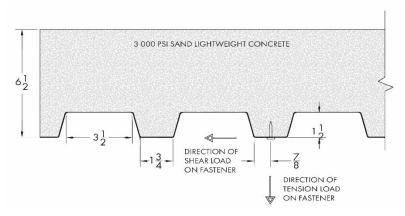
B—FASTENER INSTALLATION IN 11/2-INCH-DEEP STEEL DECK
